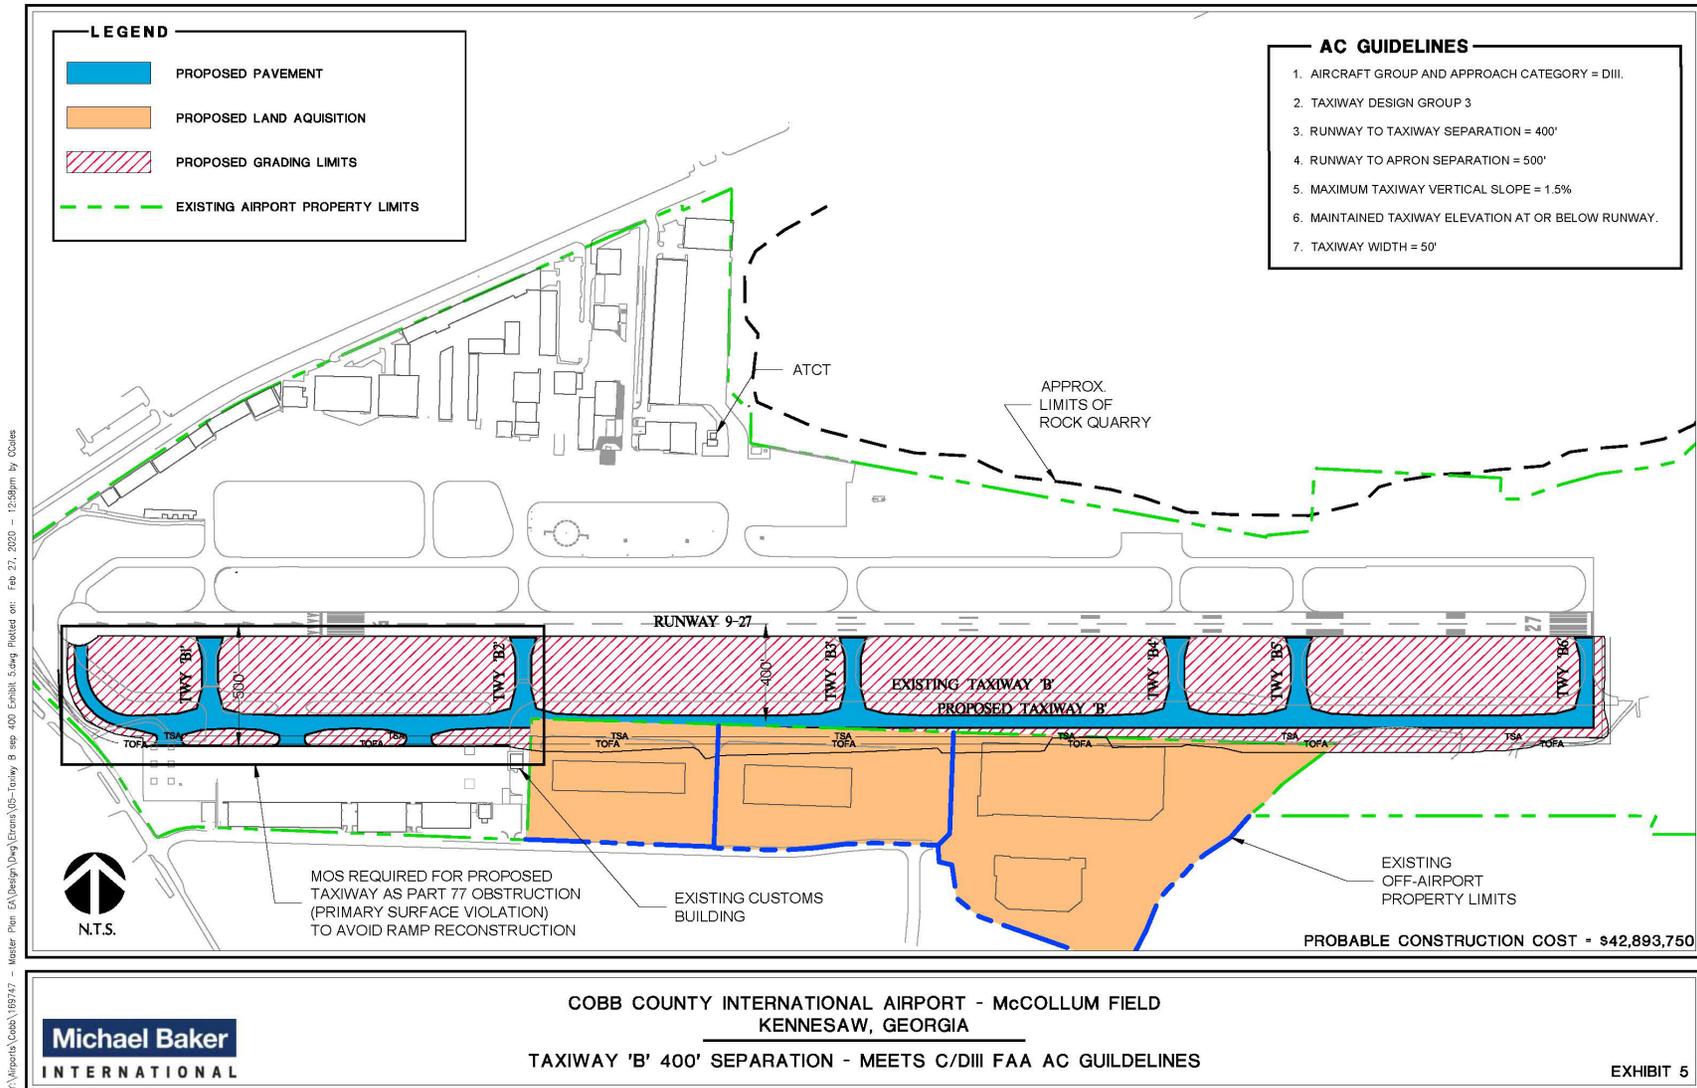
Taxiway ‘B’ Relocation, Alternative 3b (400-foot Runway/Taxiway Separation)
